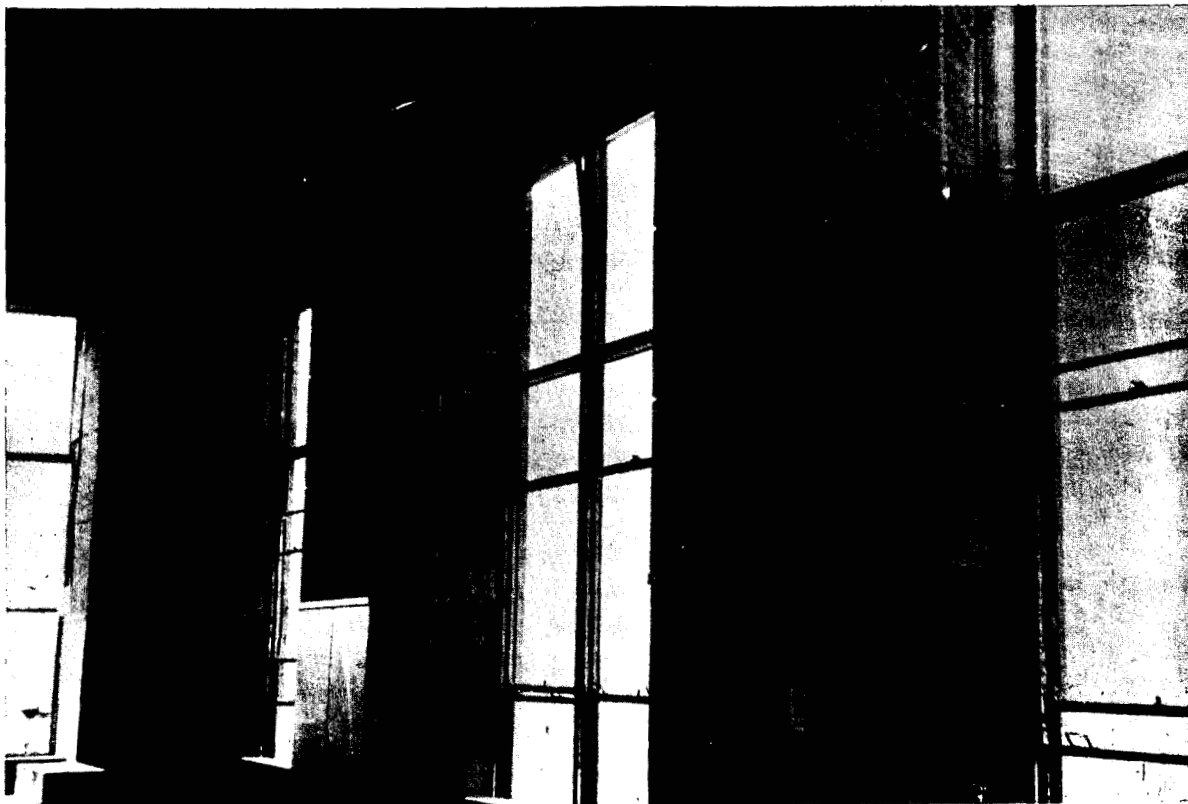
(5H)--1700 meters. Shadow cast by the window frames in the Post-Office Savings Bank. People in this building were said to have been burned through the window glass. (Photo File #HE 137.)
